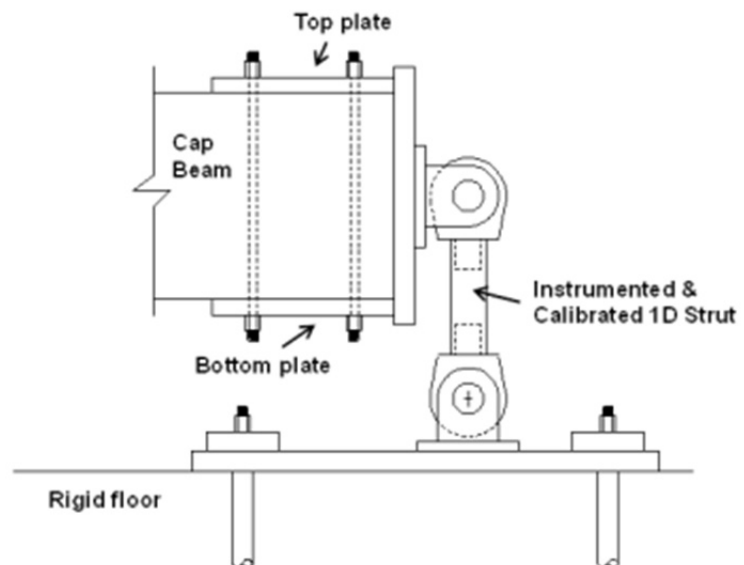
Vertical 1D calibrated strut used at the specimen's cap beam ends.
